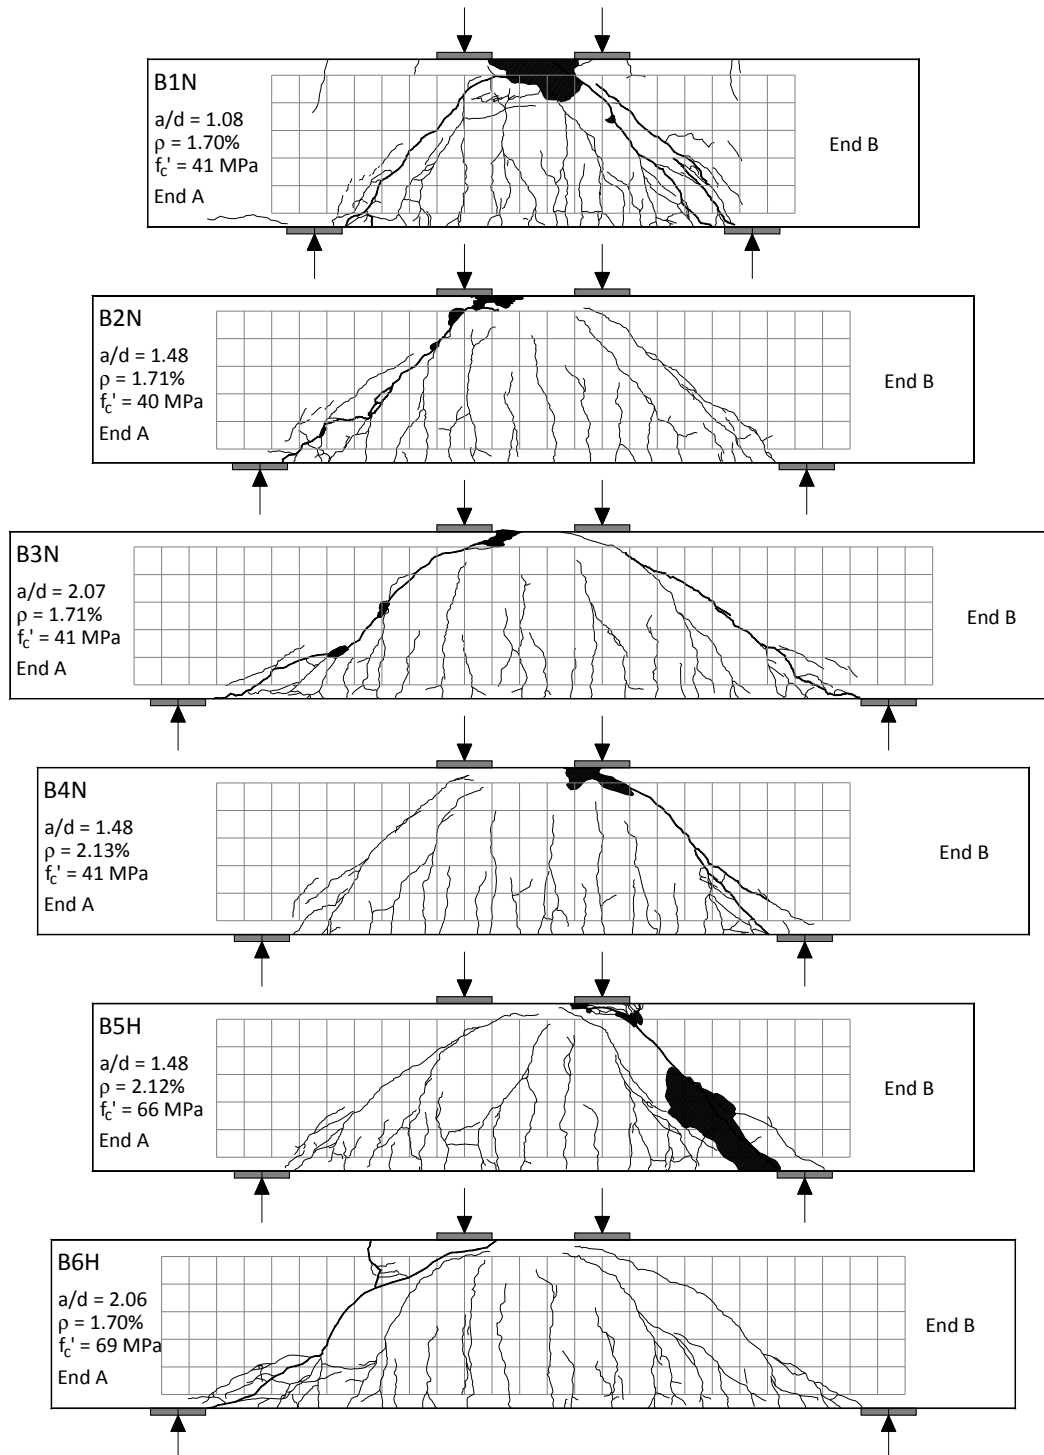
Crack diagram after failure of specimens with $h = 600 \text{ mm}$.
